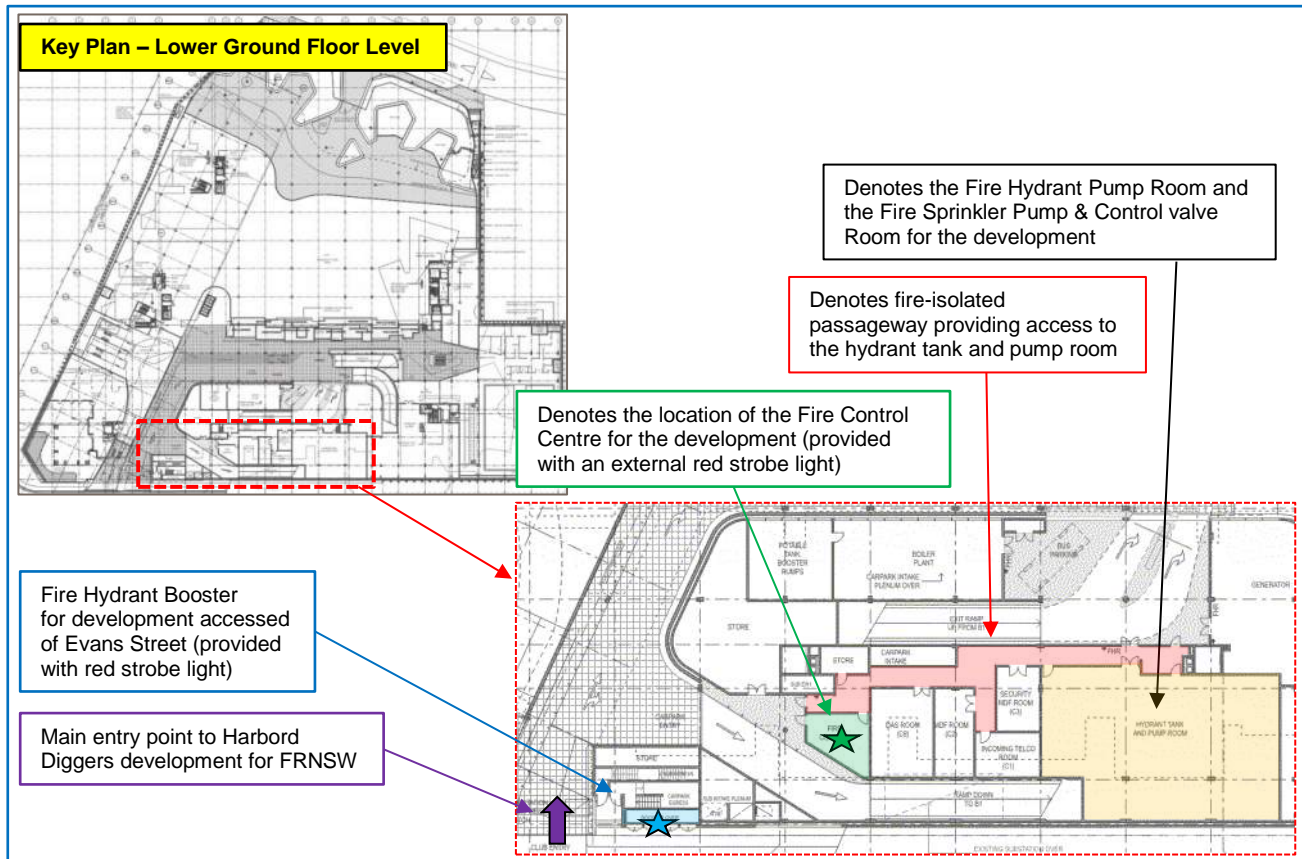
Fire brigade access & proposed Fire Fighting facilities for brigade upon arrival
